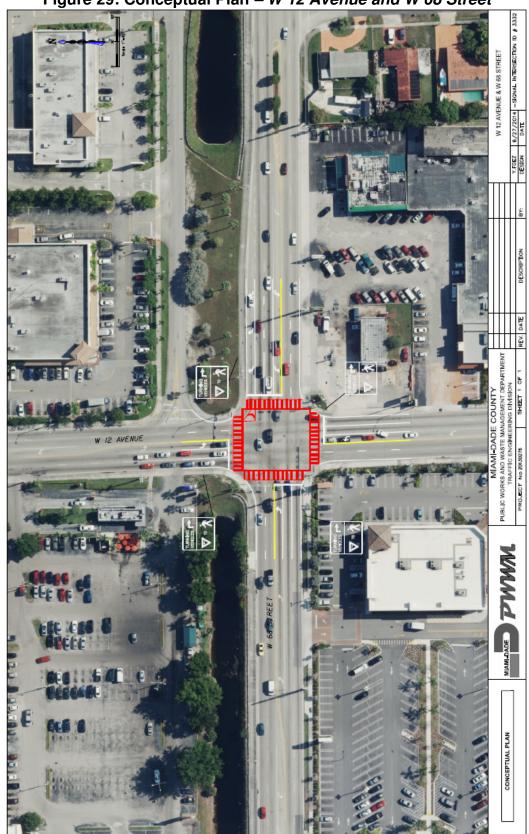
Conceptual Plan – W 12 Avenue and W 68 Street
